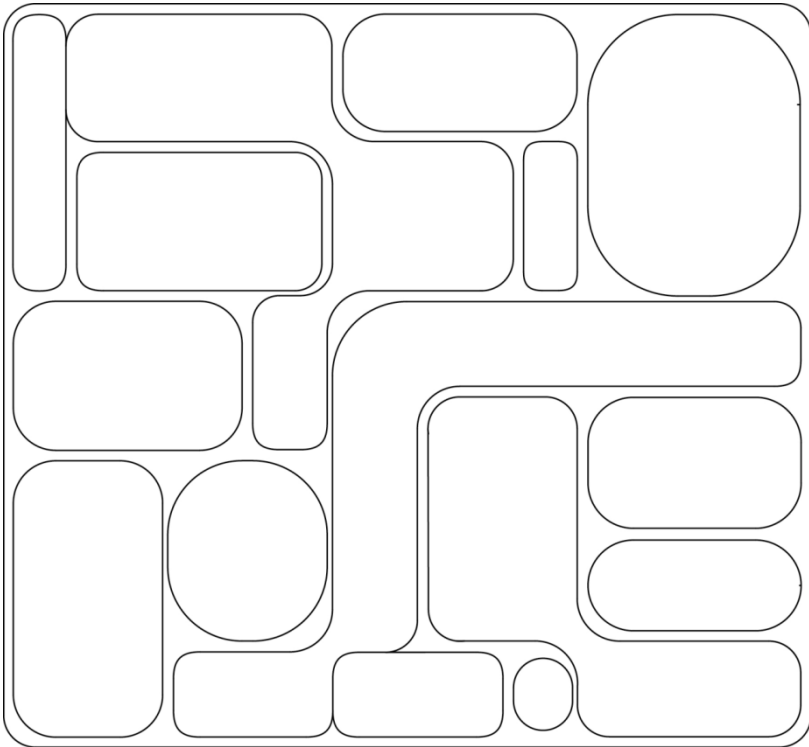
SANAA (2006), plan diagram of the Glass Pavilion [drawing by the author]
